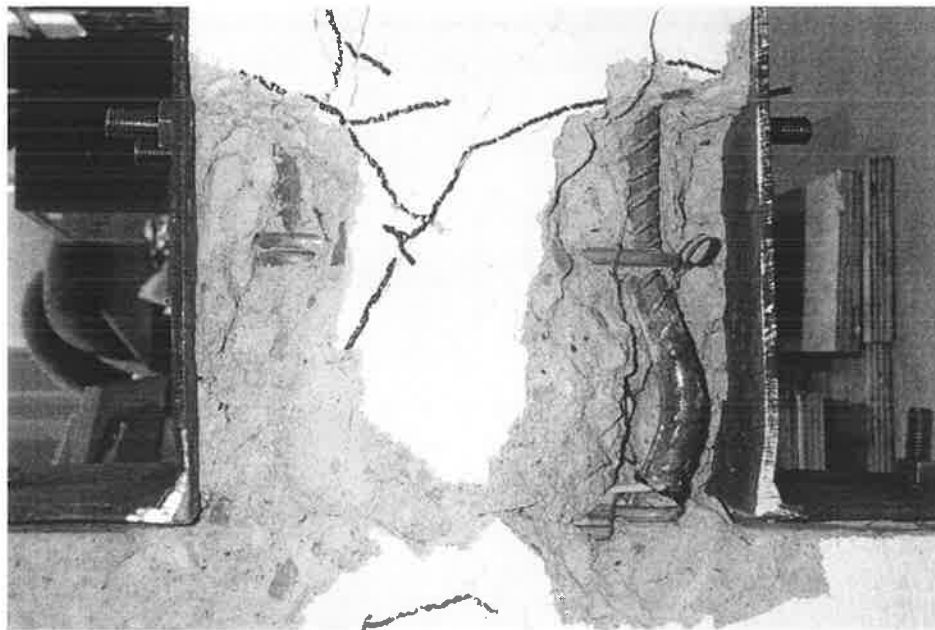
Front view of plastic hinge zone after testing for specimen 4ACP6
